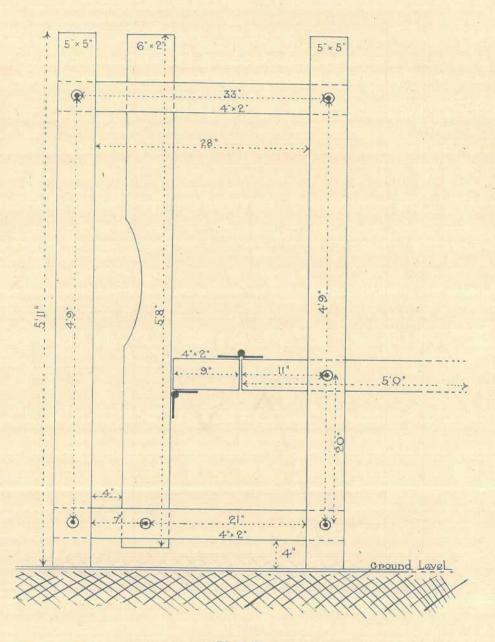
FRONT ELEVATION OF BAIL, WITH BAIL CLOSED.
